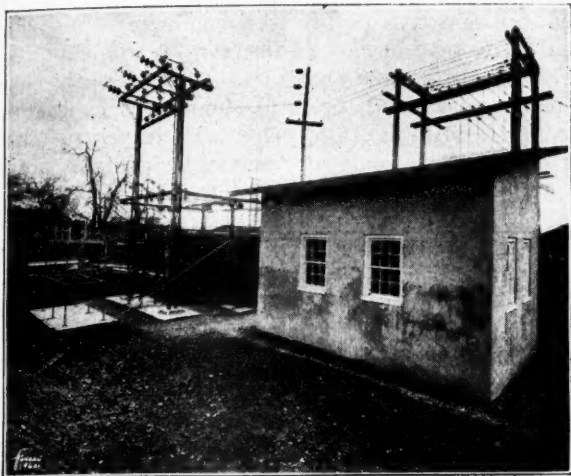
OUTSIDE VIEW OF SUBSTATION
